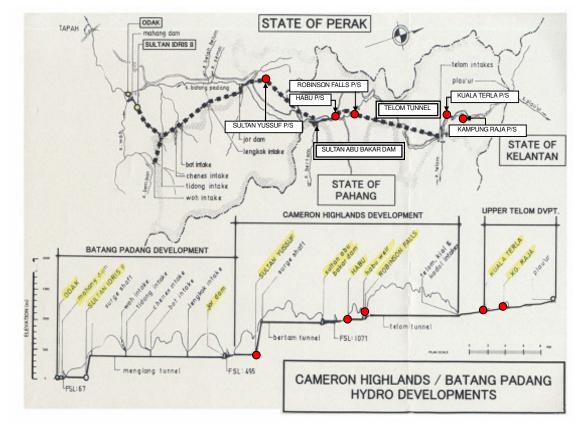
Layout Plan of the Cameron Highlands Hydroelectric Scheme
